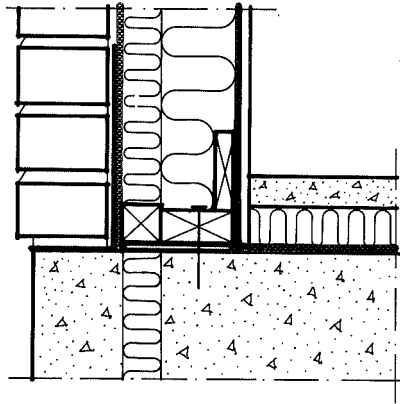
An example of a joint between an outer wall with a brickwork facade and a concrete slab with insulation on the upper surface. In this version, concrete is used as a foundation for the floor covering. This necessitates an extra wooden beam at the lower edge of the wall. As a variation of this solution the facade is allowed to extend somewhat over the concrete skirting. In all other respects the construction is the same. This design also requires insulation of the edge beam.
